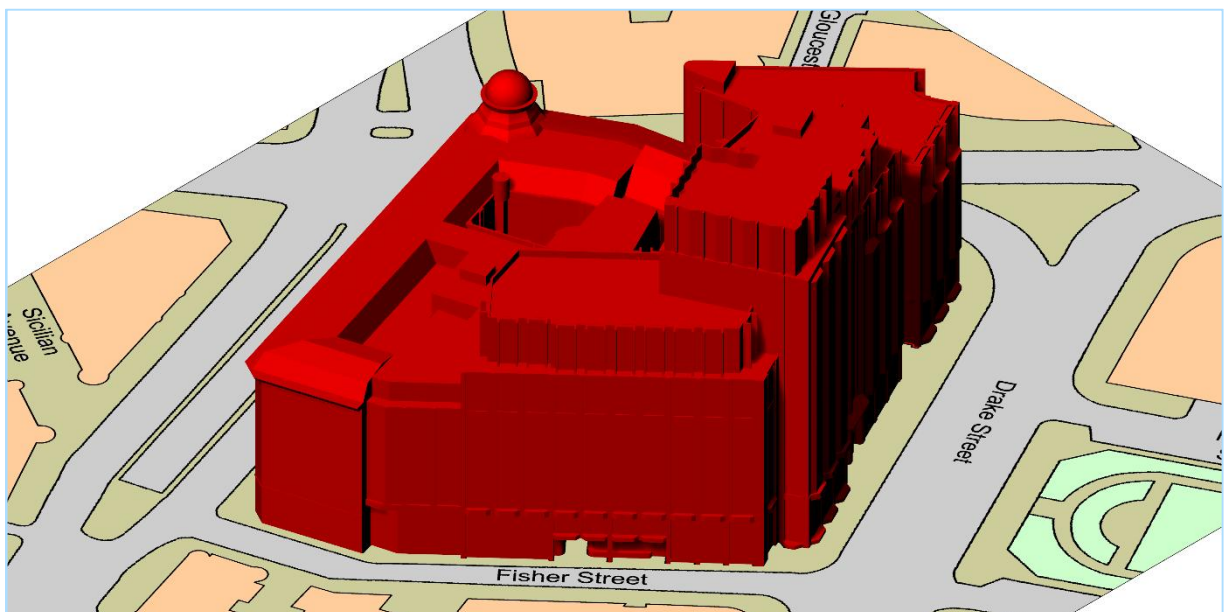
Former Central St Martin's Site - 3D model viewed from the southeast
